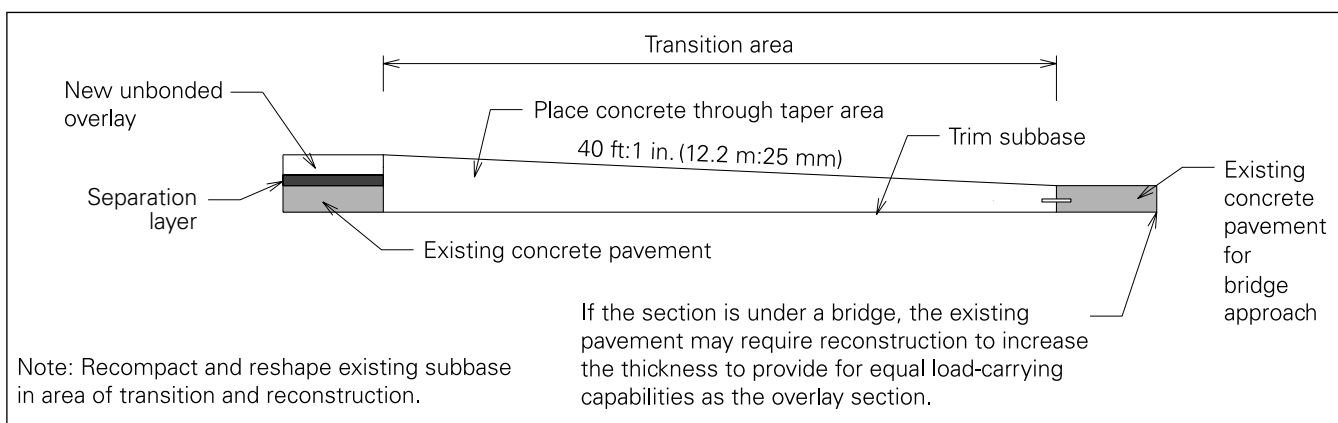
New transition tapers used to meet bridge approach slabs or maintain clearance under bridges with unbonded overlay of concrete pavement (adapted from ACPA [1990])
